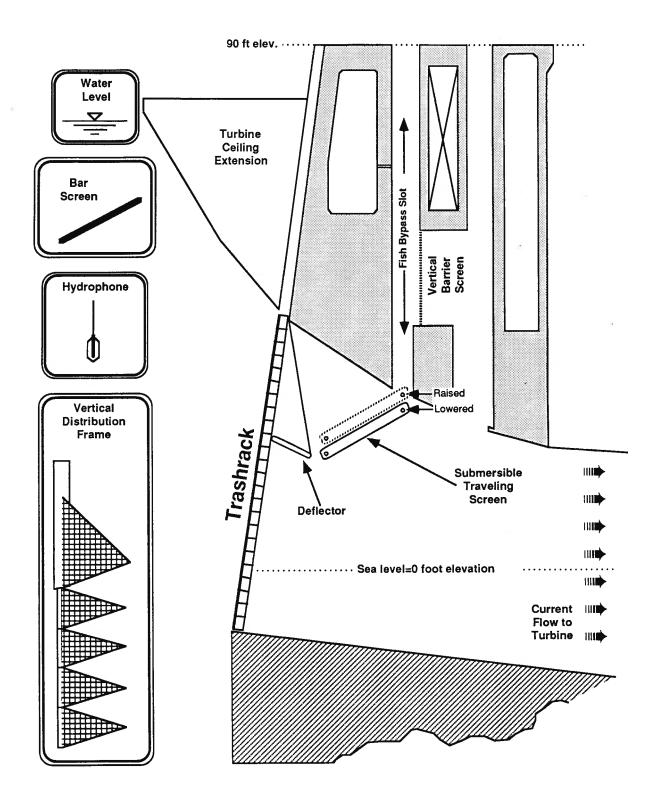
Cross Section of Powerhouse II, Bonneville Dam.
